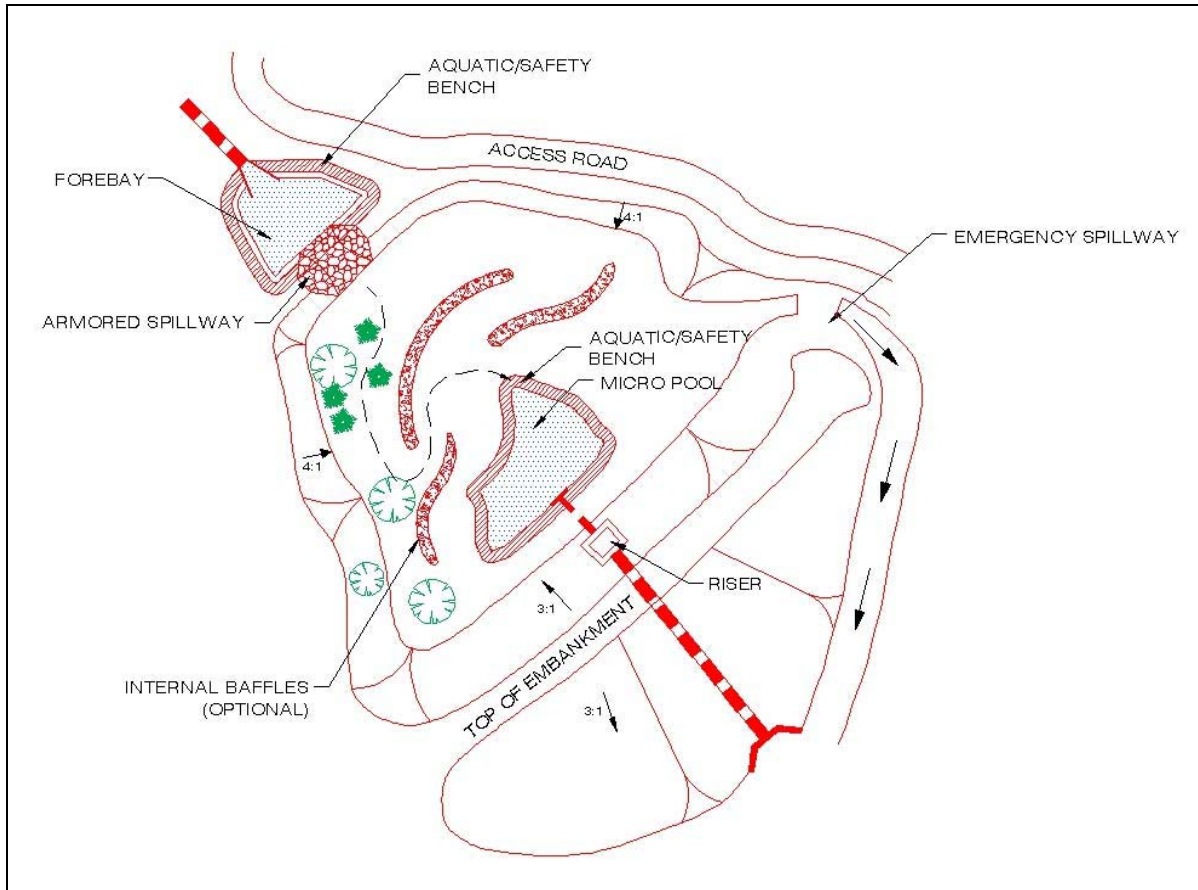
Typical Extended Detention Pond (P-3) Details.
